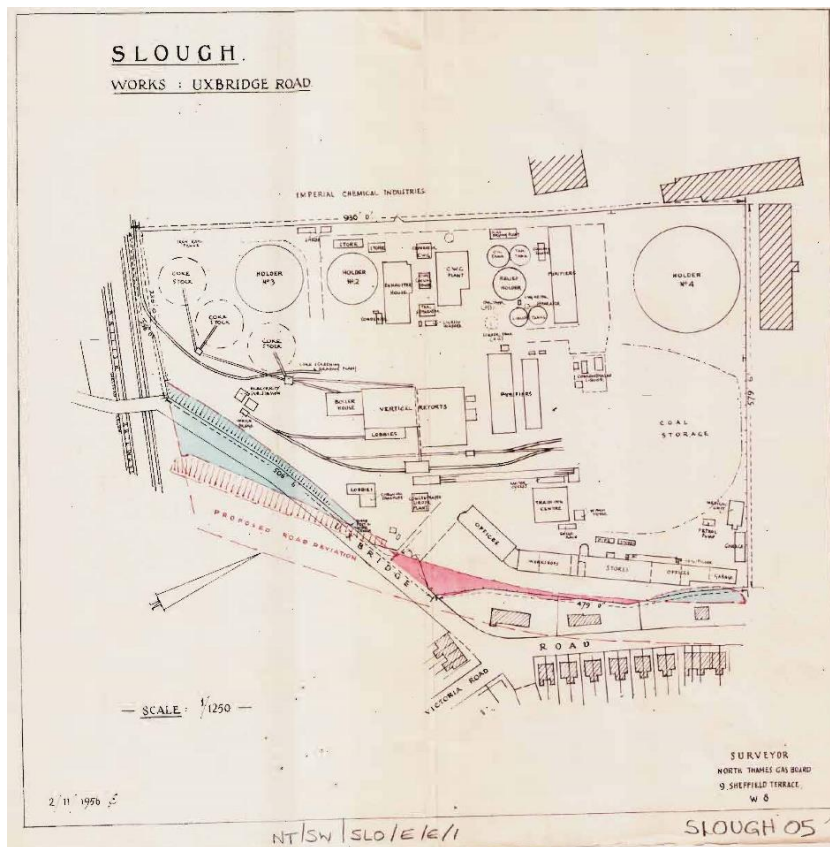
Plan of 1956 showing the Uxbridge Road Works (NGA ref: NT/SW/SLO/E/E/1).
